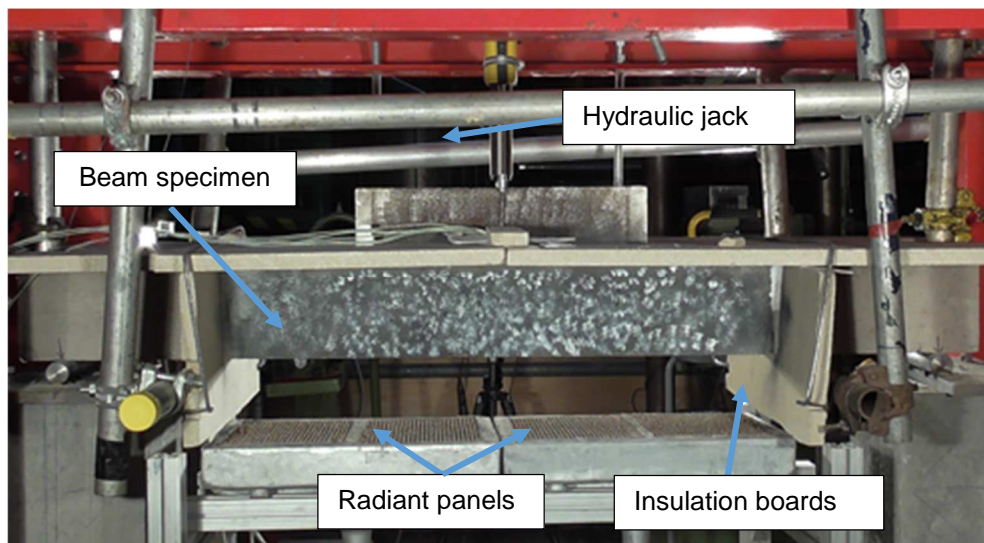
Testing arrangement of four-point bending test with localised heating.
